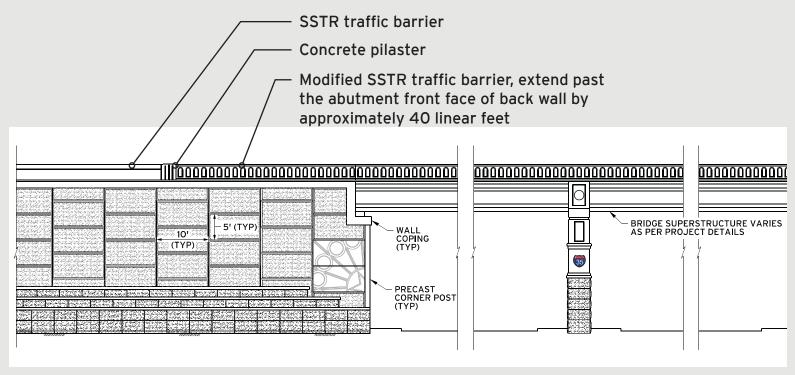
Bridge Elevation (I-35 Overpass, Desirable Condition)
